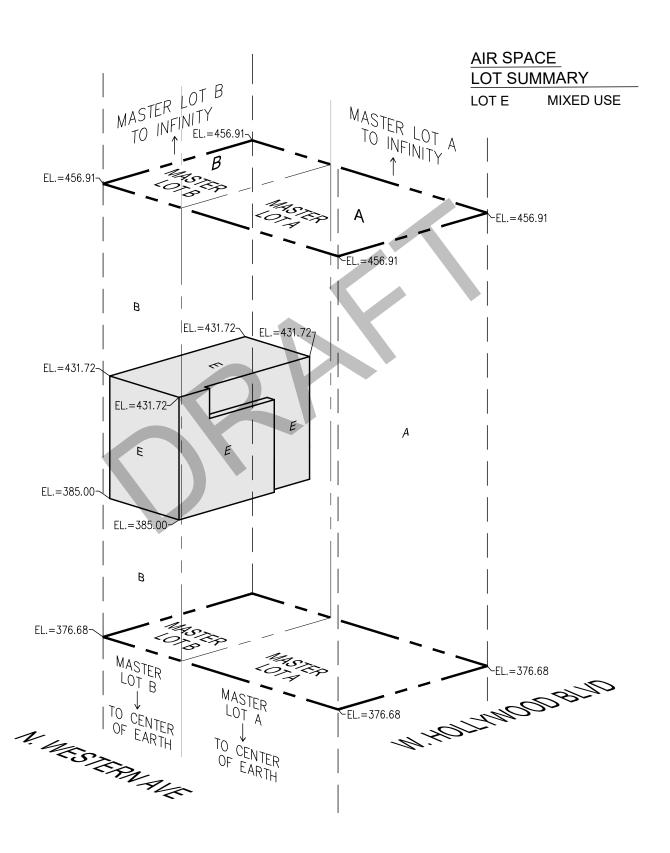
# EXHIBIT MASTER LOT B - SOUTHWEST ISOMETRIC VIEW
